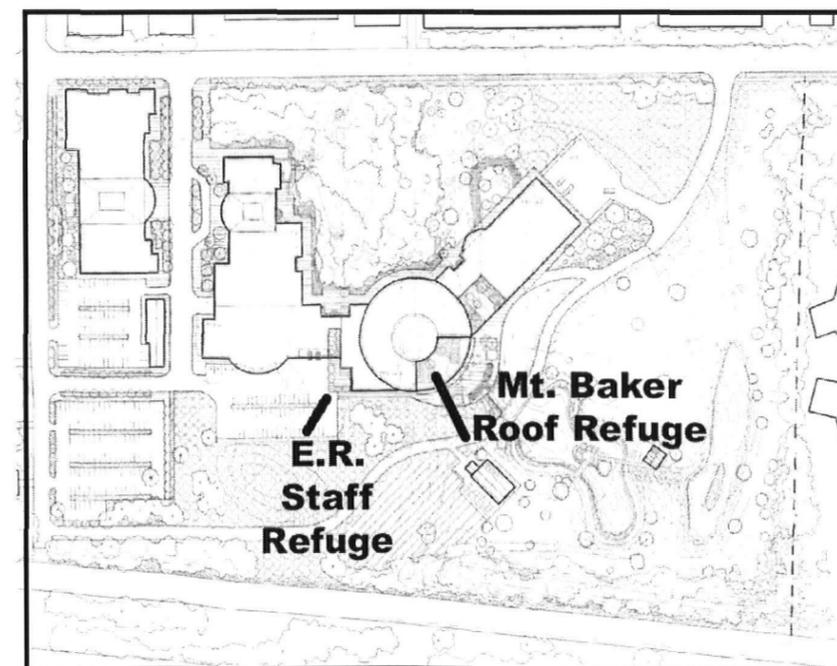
(above) : Detail Plan of Mt Baker Staff Retreat.
